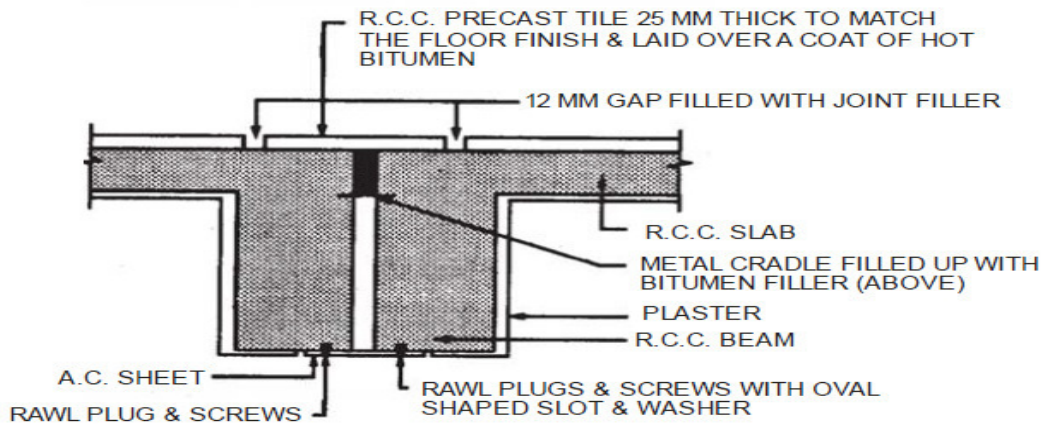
Typical Details of Expansion Joint at Floor
